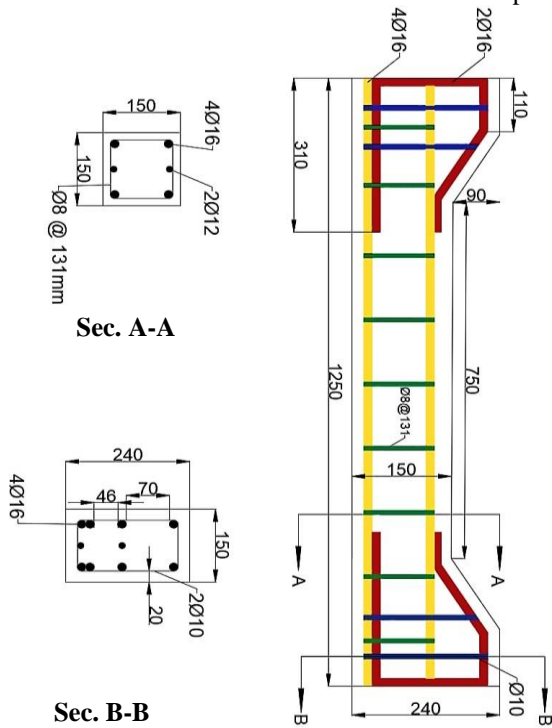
Geometrical and reinforcement details of LWRC columns used in experimental tests of Al-Naqeeb [20]
